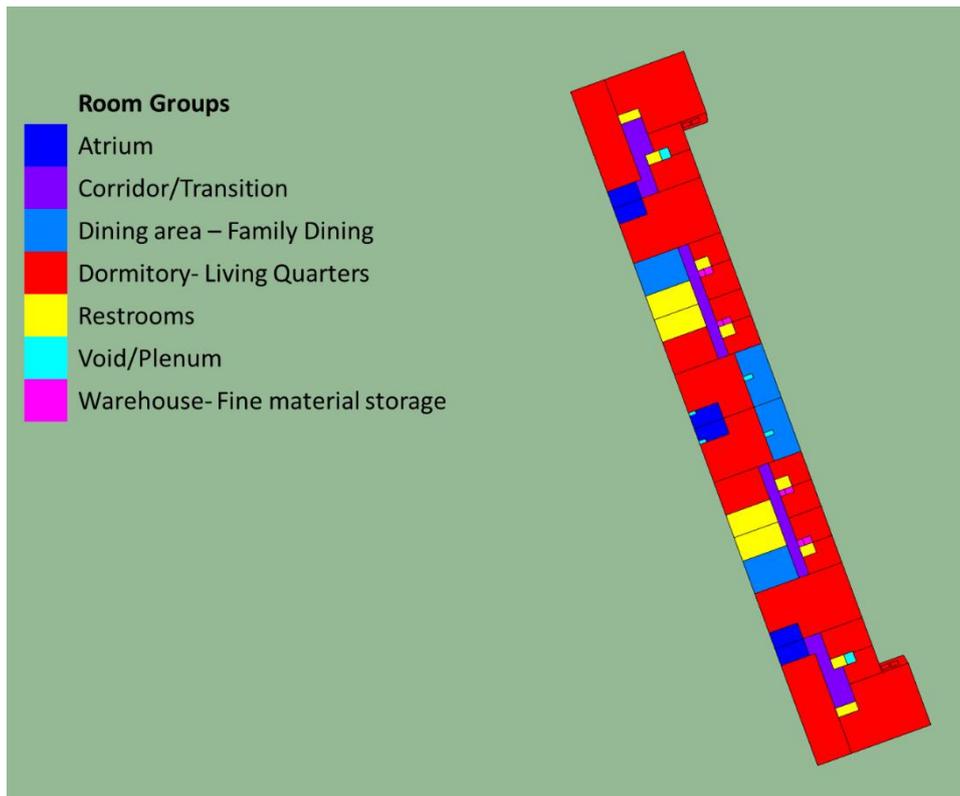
The first floor of the virtual demo building in Amsterdam (Source: IES)
